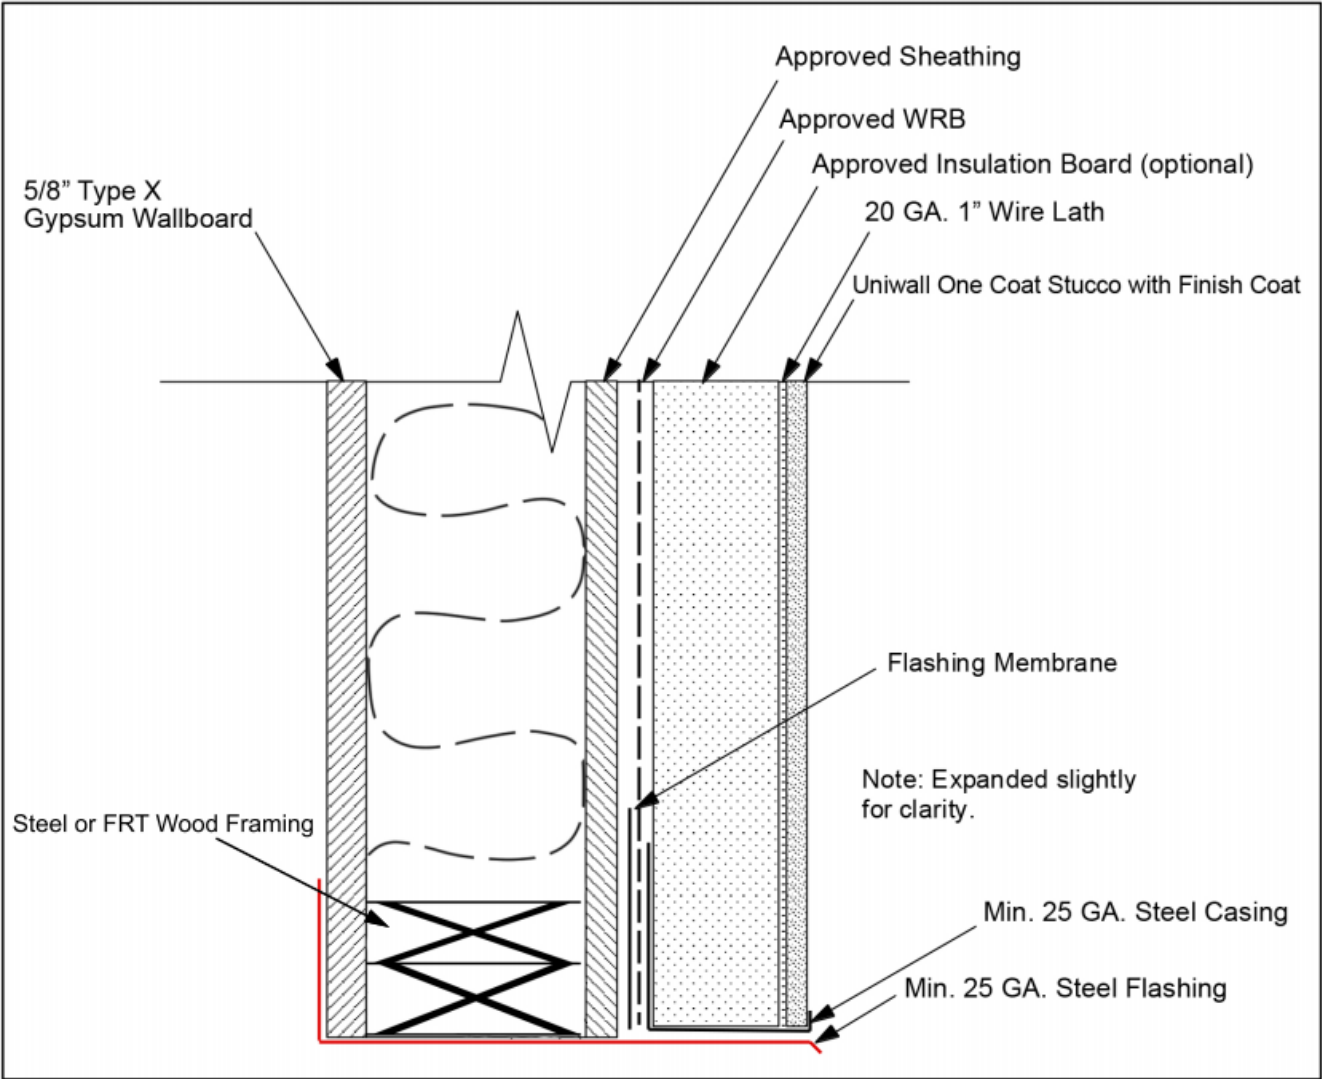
TYPICAL HEAD OF WINDOW OPENING CONSTRUCTION FOR NFPA 285 COMPLYING WALL (SEE TABLE 1 FOR DETAILS)
